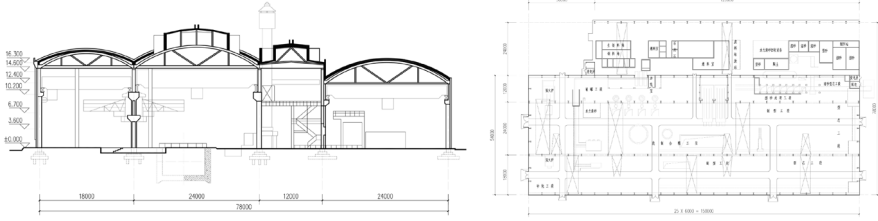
Section of the Heavy Casting Workshop, Pengpu Machine Factory
